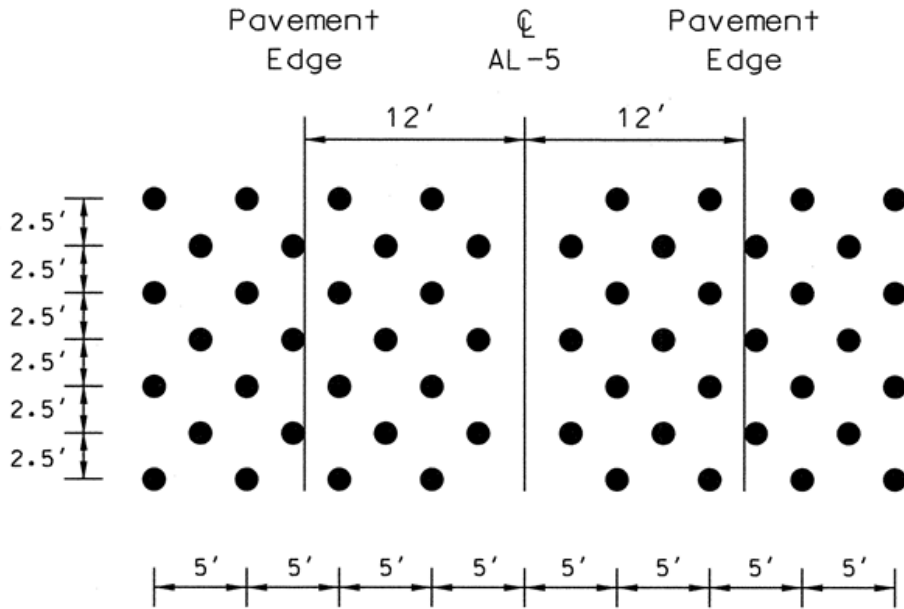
Lime Columns Plan View Detail (ALDOT 2015)
